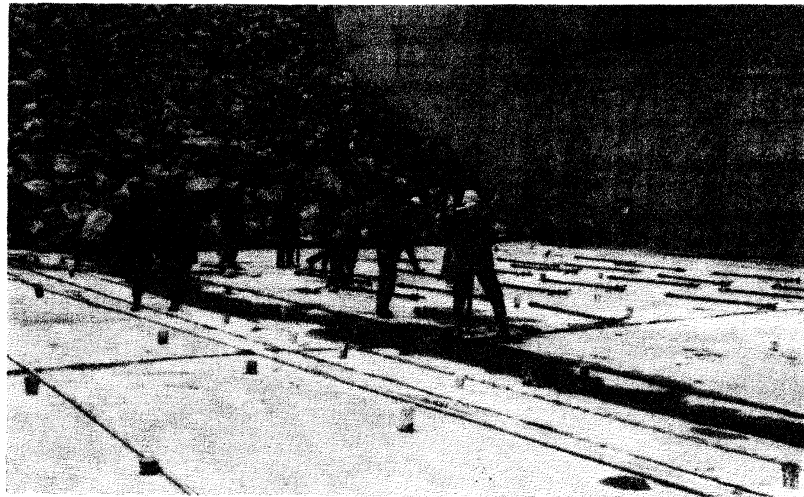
Wooden bungs placed in holes to arrest grout interconnections. This photograph shows some of the narrow slabs of the articulation
